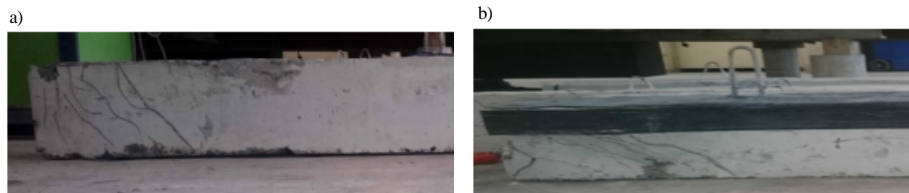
a-d): Major modes of failure obtained from testing cantilever beams; a) Diagonal cracks of reinforced concrete cantilever beam without CFRP sheets; b) Diagonal cracks and CFRP debonding of reinforced concrete cantilever beam with CFRP sheets
